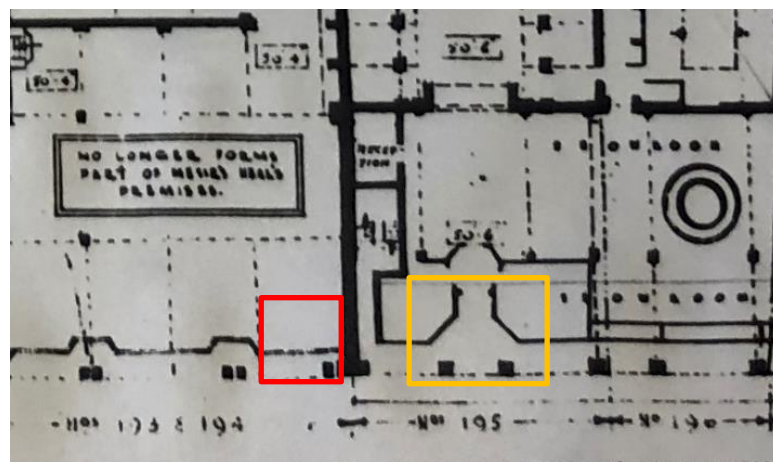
Extract of 1937 Ground Floor Plan (existing entrance highlighted in orange and current entrance in red)
